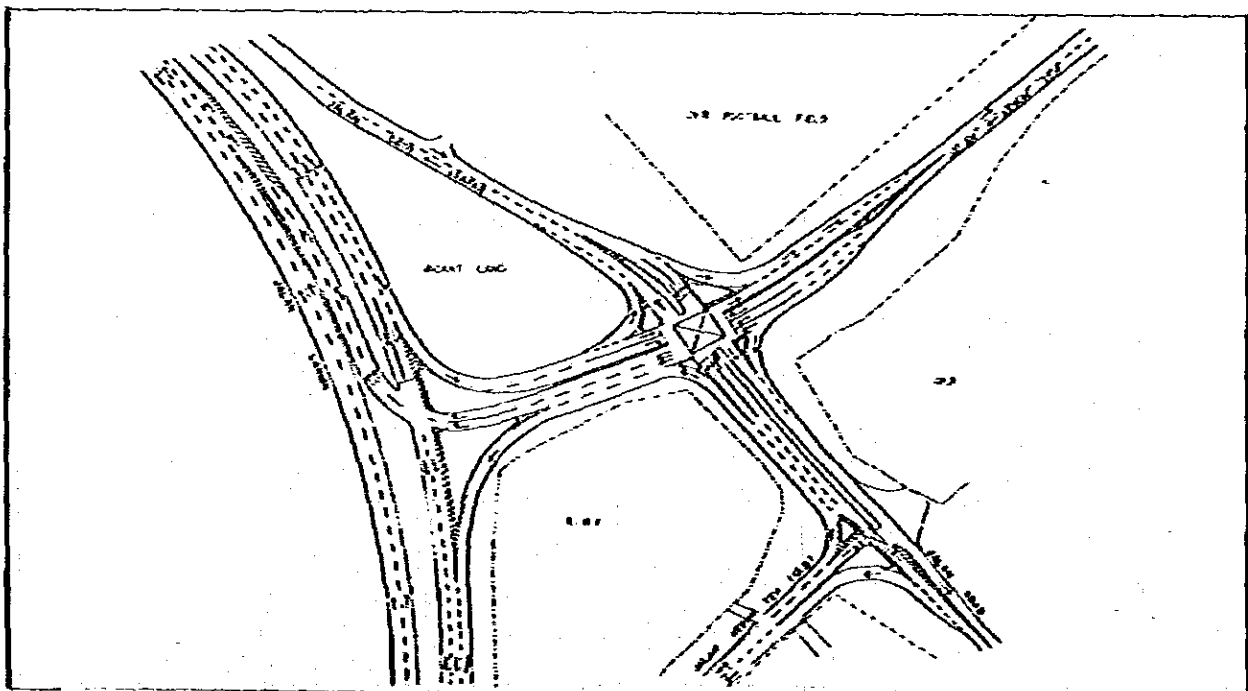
PROPOSED INTERSECTION IMPROVEMENT PLAN (IMMEDIATE ACTIONS)
